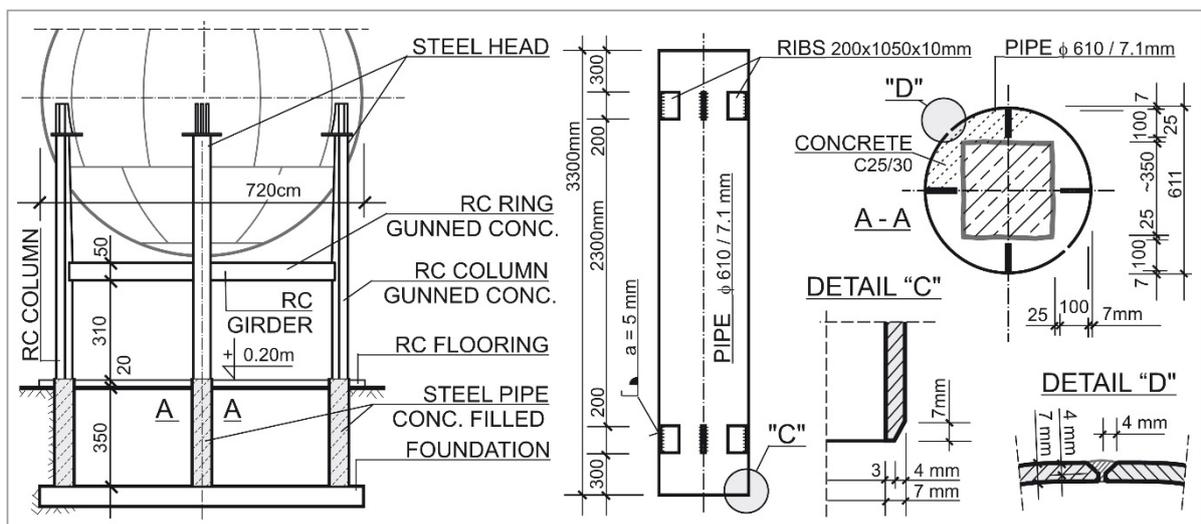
Reinforcement concept of the degraded elements of the 195 m³ gas tank
